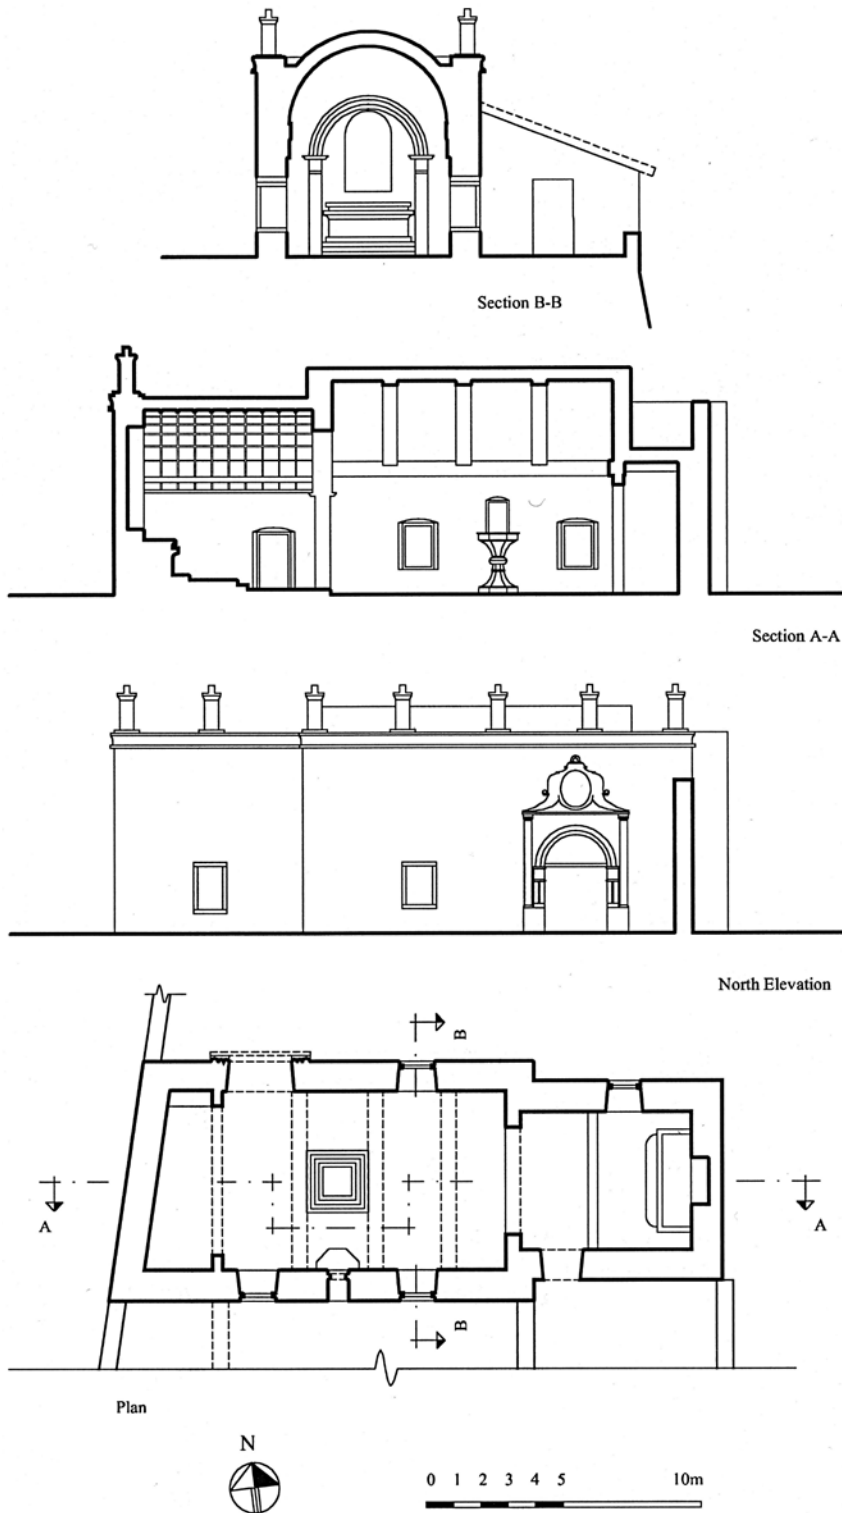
St James's Chapel (22), plan; north elevation showing the entrance; longitudinal section A-A and transverse section B-B showing the building in its original form. In the plan the commemorative monument erected in 1906 at the centre of the nave is marked but in Section A-A the monument, obscuring the pulpit, is not shown.
